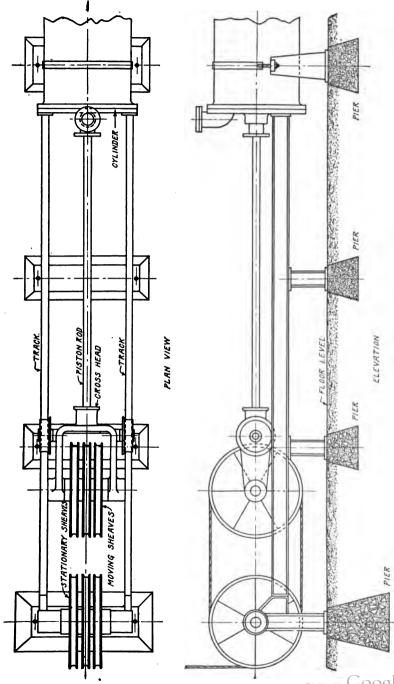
Horizontal Cylinder "Pull-Type" Hydraulic Elevator
